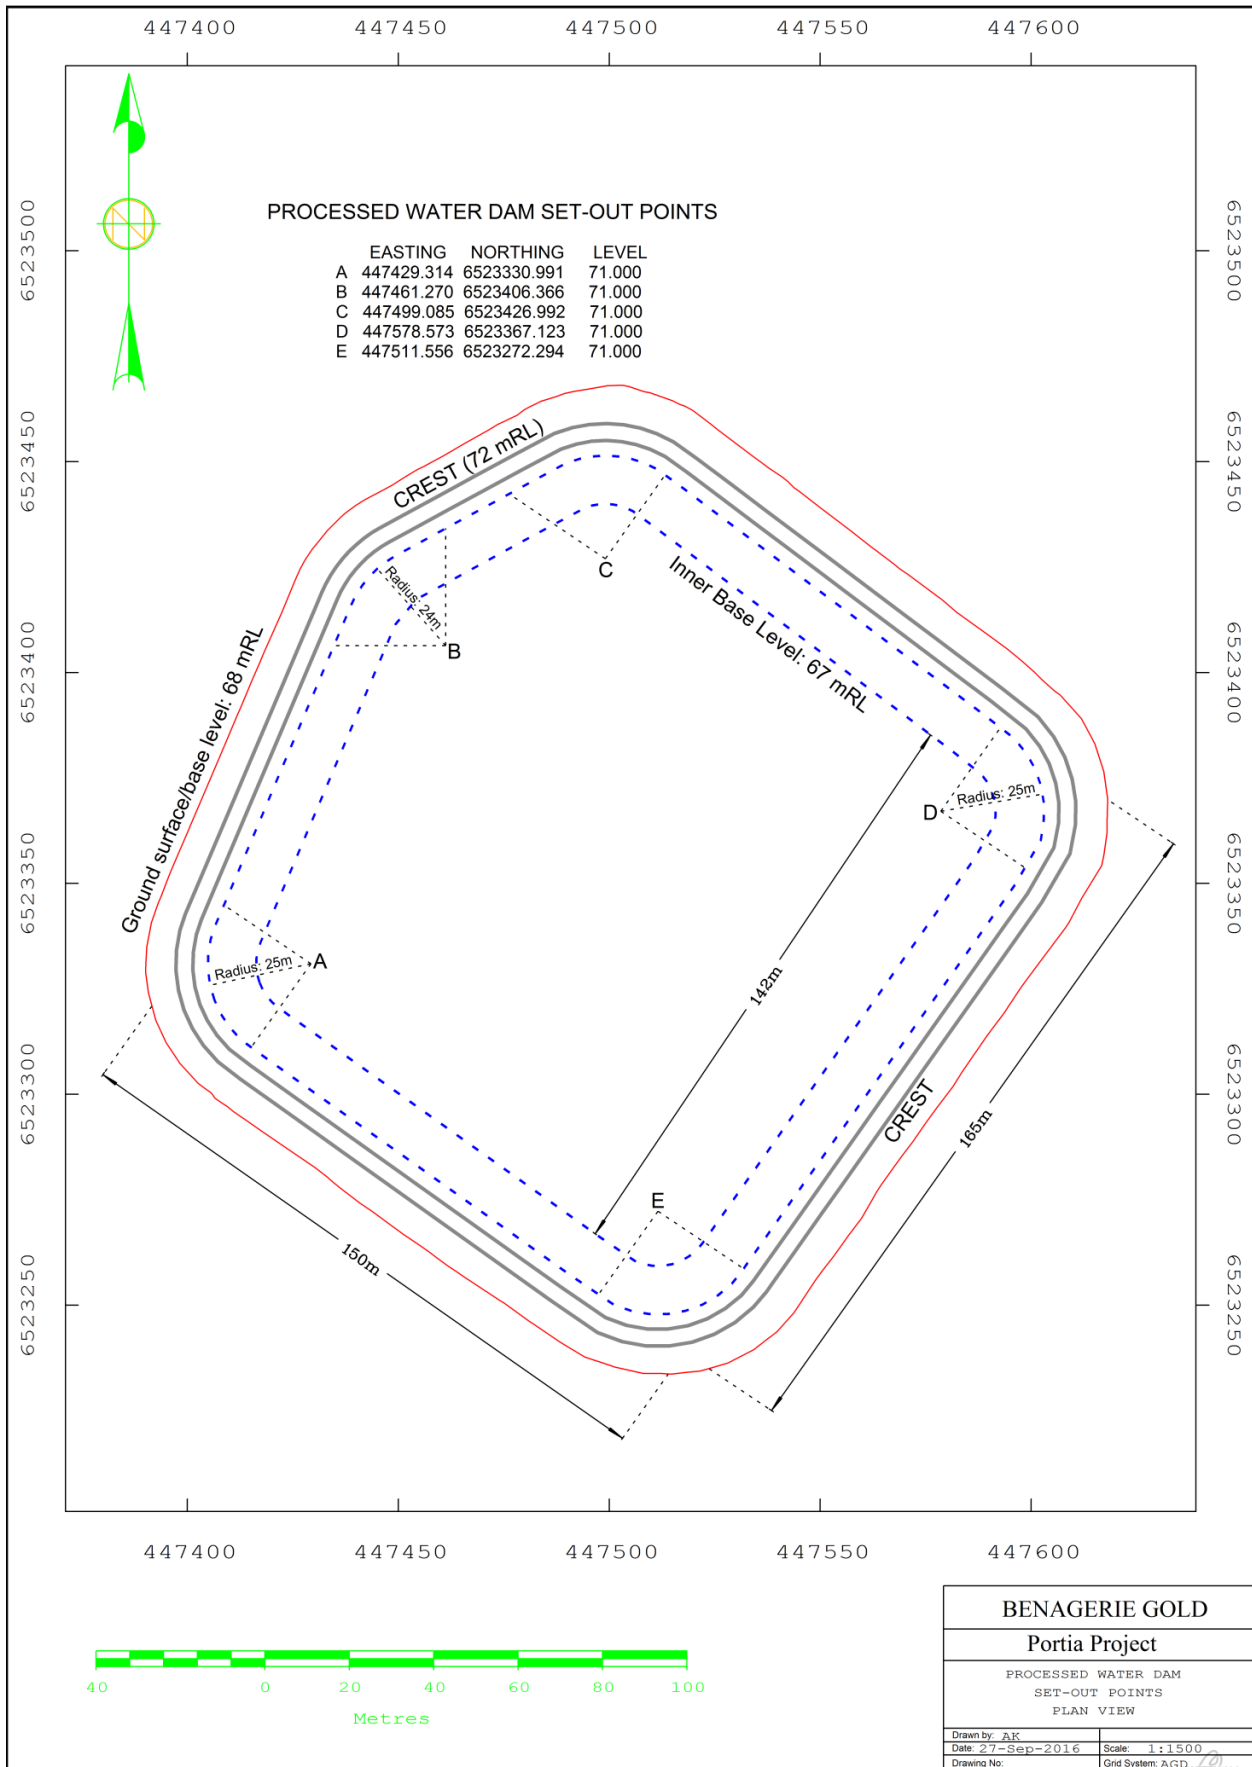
Plan View of Balance Pond 1 (previously Process Water Dam) (Design)
